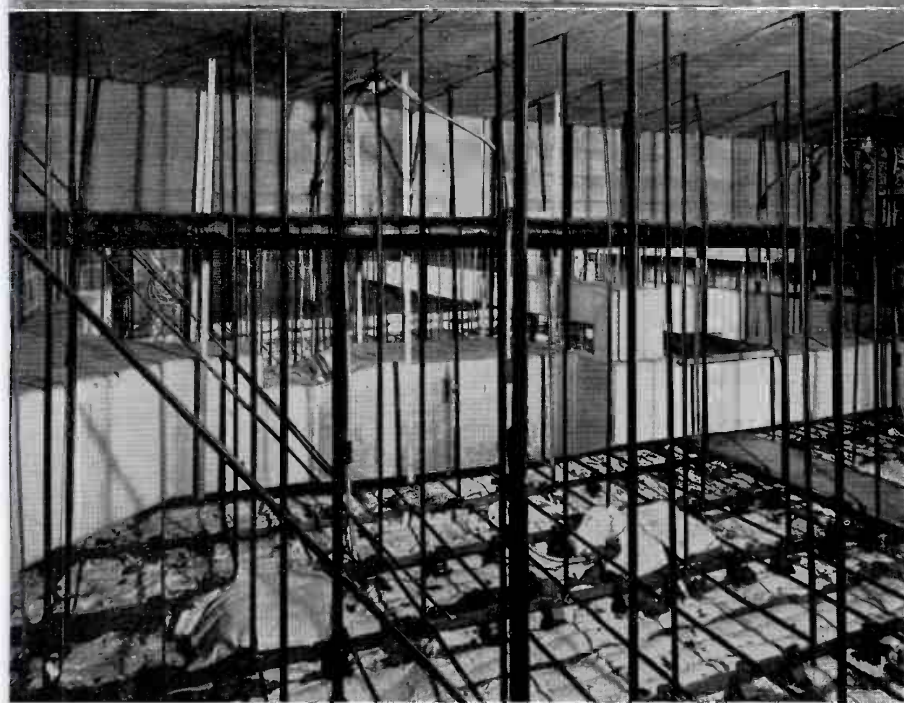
(left, lower). Studio floating ceiling which uses the Johns Manville system of ceiling isolation. Ceiling consists of wire lath and plaster with 2-inch rockwool blanket topside. Acoustic treatment of rock wool, transite splays and plywood cylinders is bottomside of ceiling.
